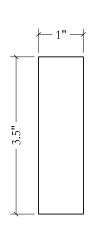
DETAIL: DOOR @ MEETING STILE UPSTATE OPTIONAL POCKET DOOR MEETING STILES
